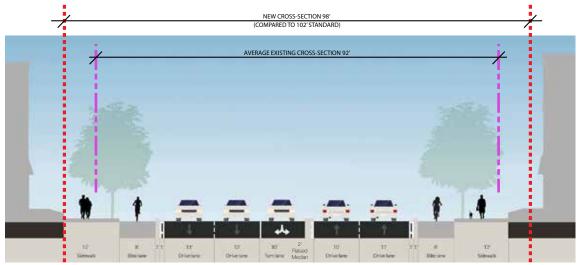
Planning for Redevelopment Cross Section: A cross-section of the Recommended Design that plans for redevelopment between City Park Avenue and Shields Street.
